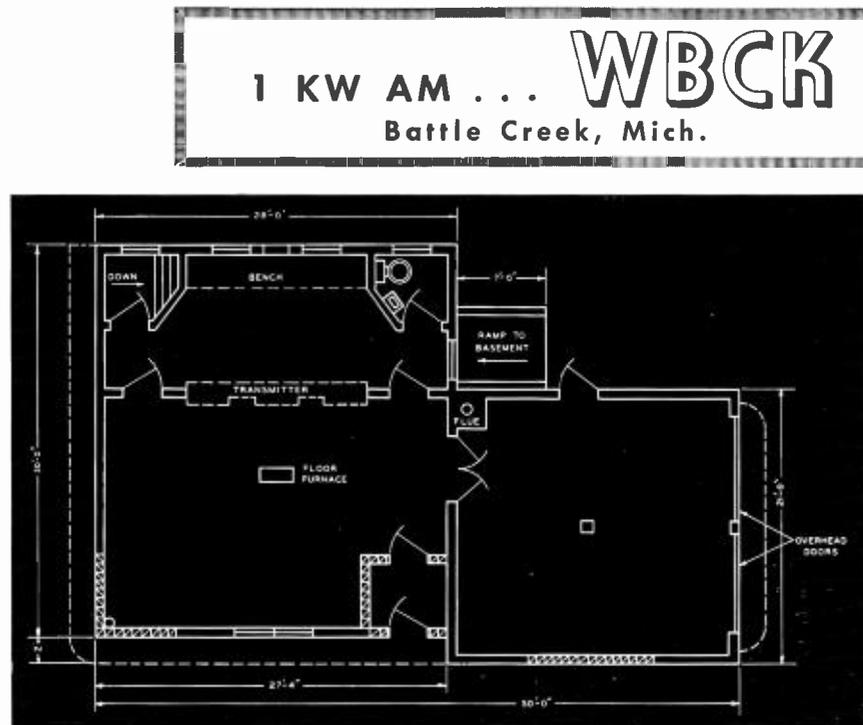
(above). The floor plan illustrates how the BTA-1L is flush-mounted in one wall, with access doors provided at each side of transmitter.
